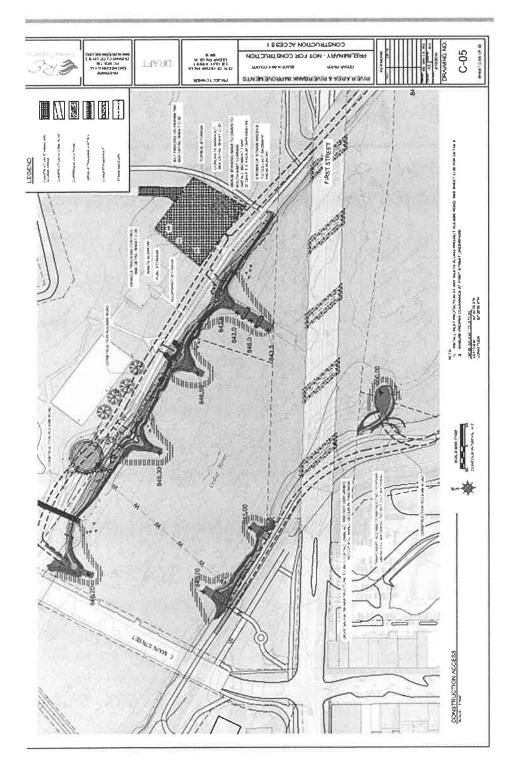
TO THIRD AMENDMENT RIVER PLACE PLAZA SITE PLAN – APPROVED MARCH 16, 2020
